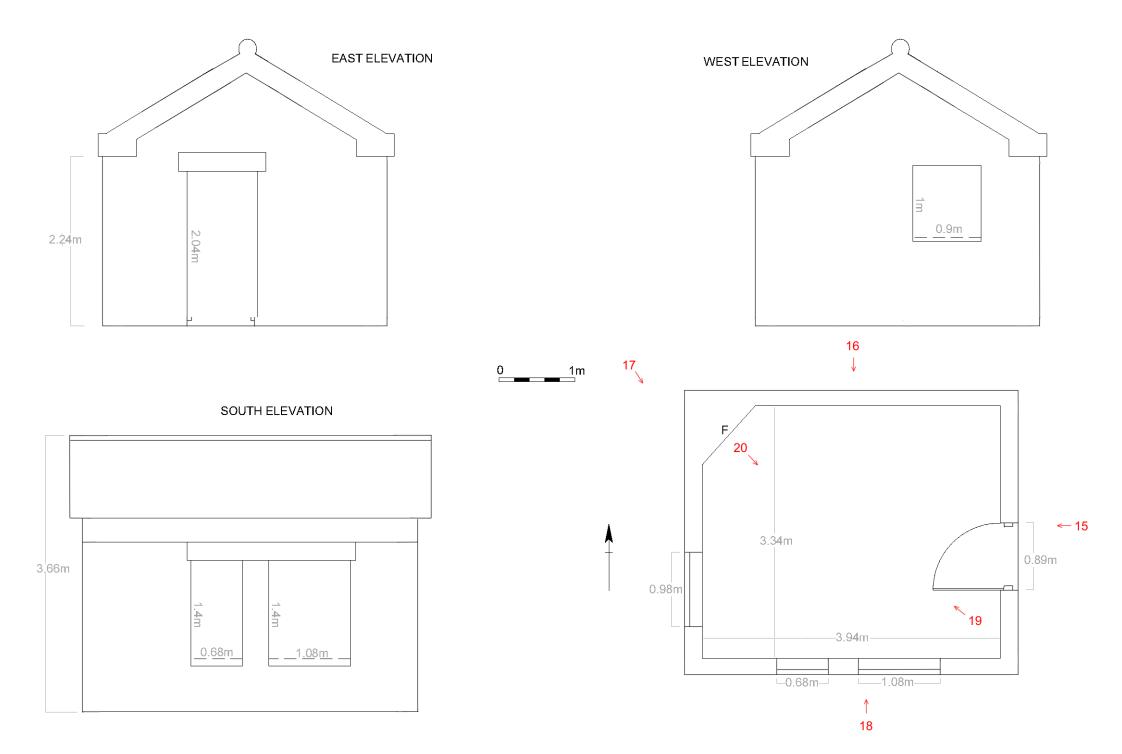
Goods Yard, Building 2: plan and elevations (*scale 1: 50*) (*location of plates shown in red*)
